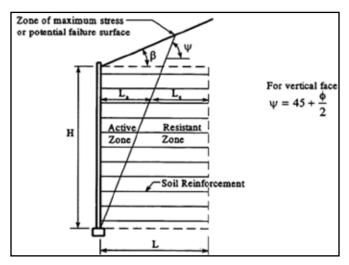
Potential failure for geogrid reinforced soil walls for internal stability calculations
